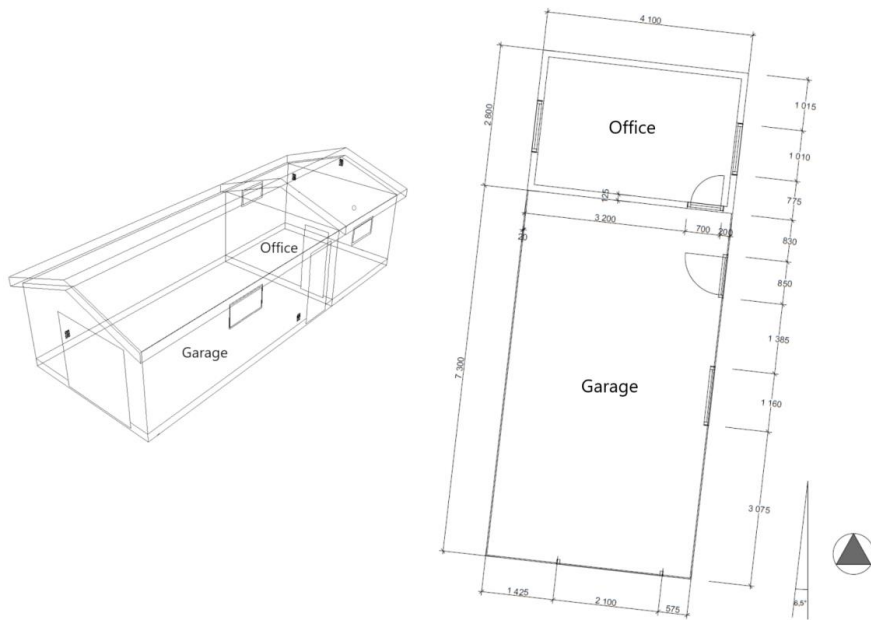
Wireframe drawing of the reference building and layout of the building with detailed dimensions in mm.
